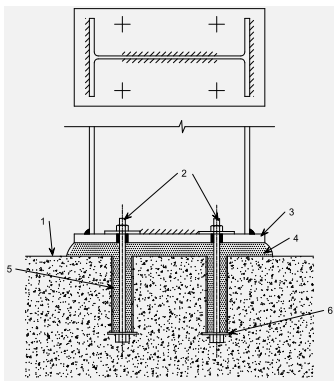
Column-to-foundation connection with steel plate and anchors
